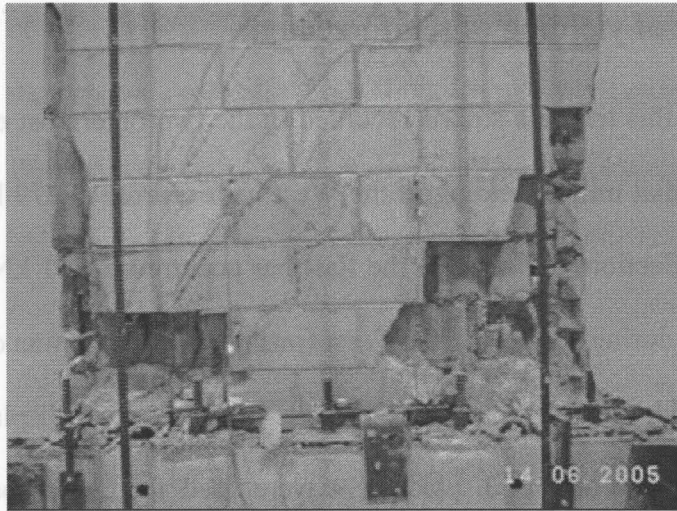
75: Damage level at the end of the test at 45 mm top deflection (Wall 6)
